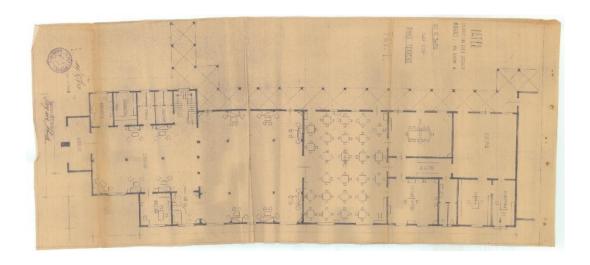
Ground Floor plan. (Ref. Arkivi Qendror Teknik I Ndertimit)
